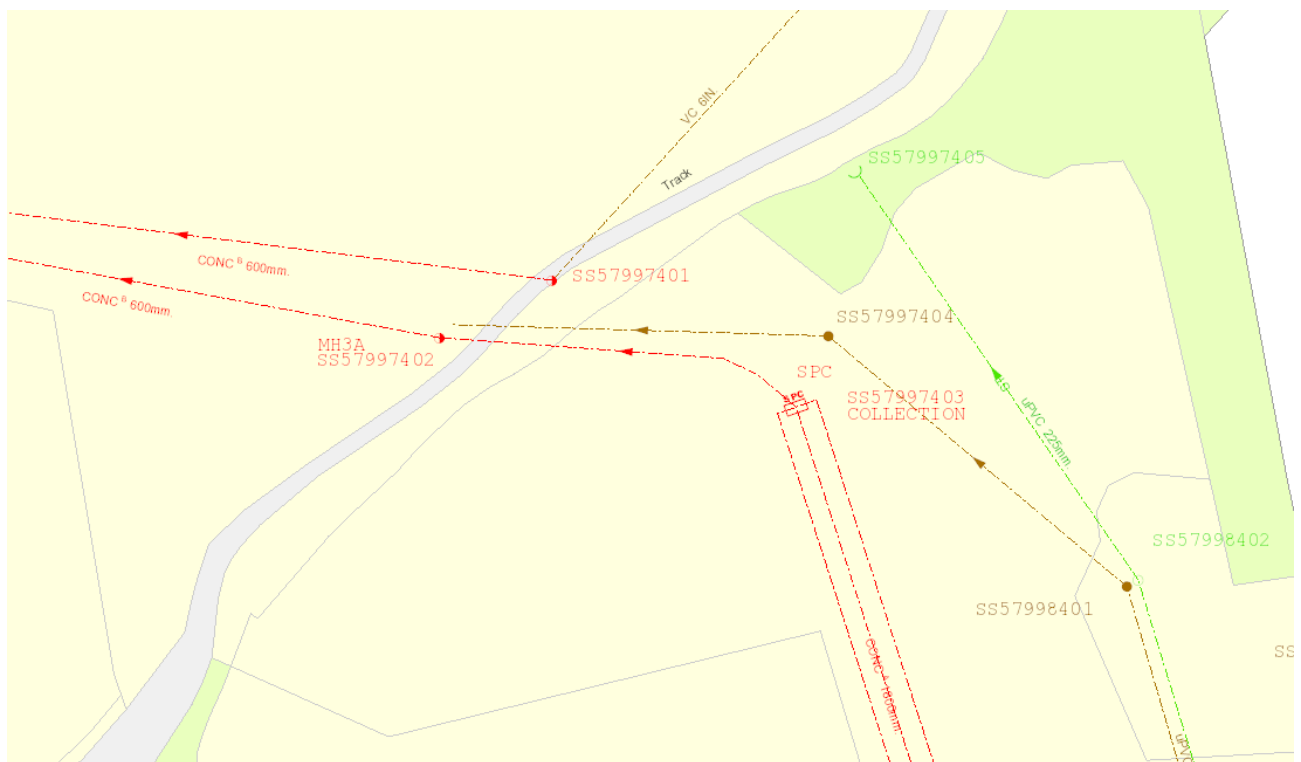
Extract of DCW/W asset plan showing connection manhole
